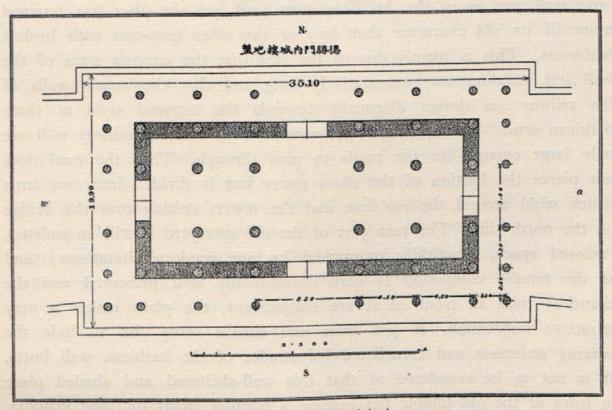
Tê Sheng Men, plan of the inner tower.
